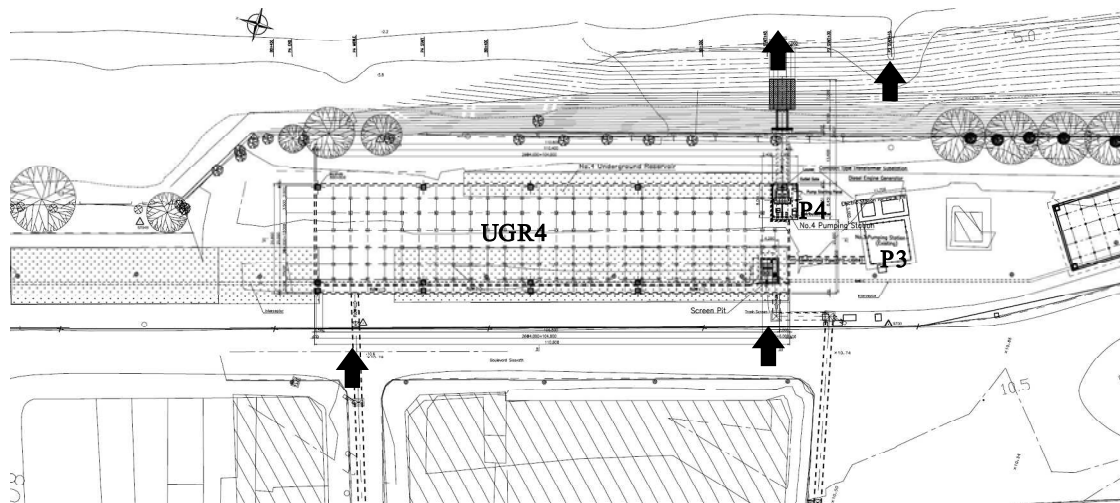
Layout of Underground Reservoir No. 4 and Pumping Station No. 4
